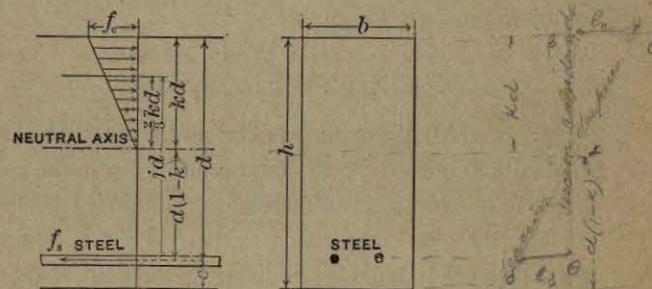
Resisting Forces in a Reinforced Concrete Beam. (See p. 751.)
